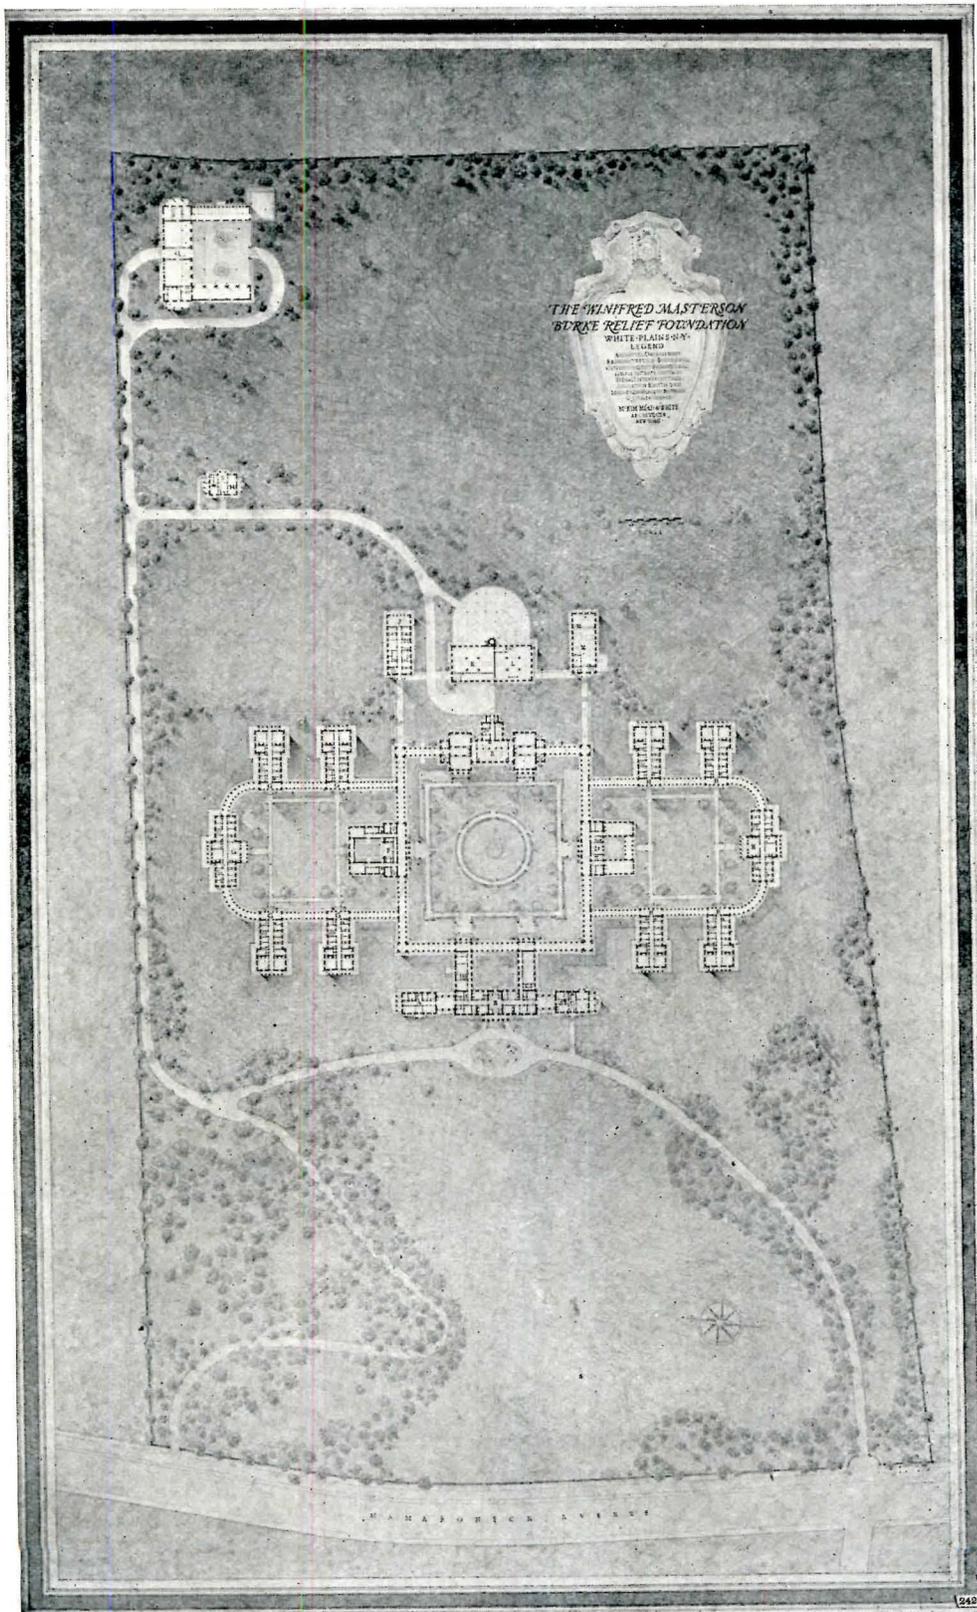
Plan of the Burke Foundation Buildings and Grounds, McKim, Mead & White, Architects.
